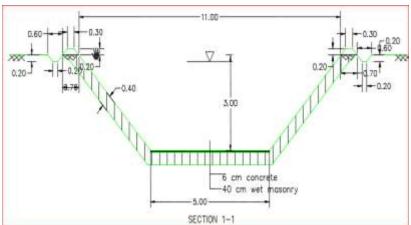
Plan & section of HH pond lined with masonry (V = 201 m³) & silt trap lined with masonry
